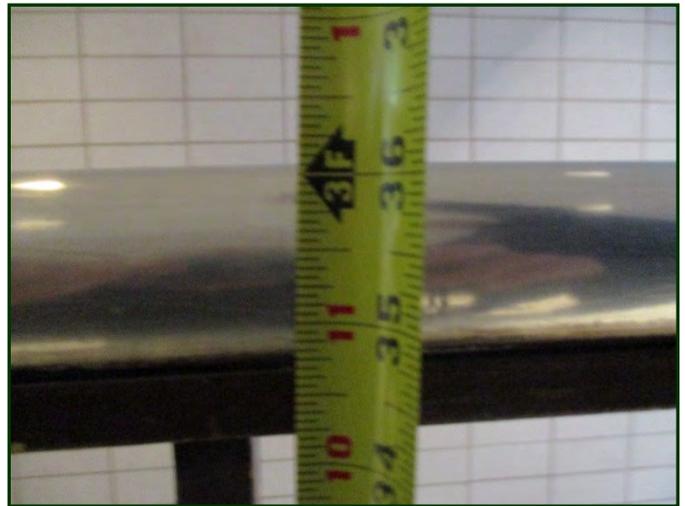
Guardrails at stair landing less than 42 inches above landing/floor level
